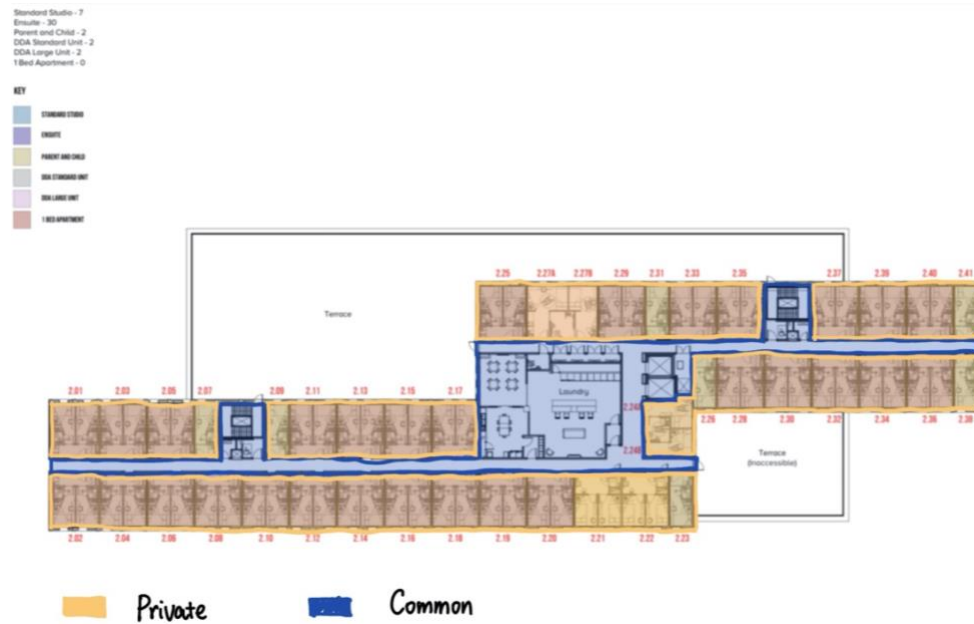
9 Public, common and private spaces in the building on 2 Floor (resource: floor plan provided by The Collective, scale: 1 to 200 in A2 paper).
